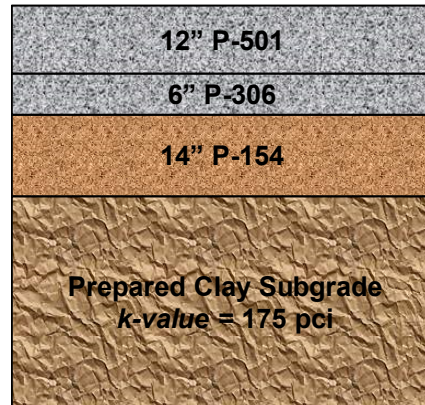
CC8 Phase 3 Joint Comparison Test Pavement Cross-Section
